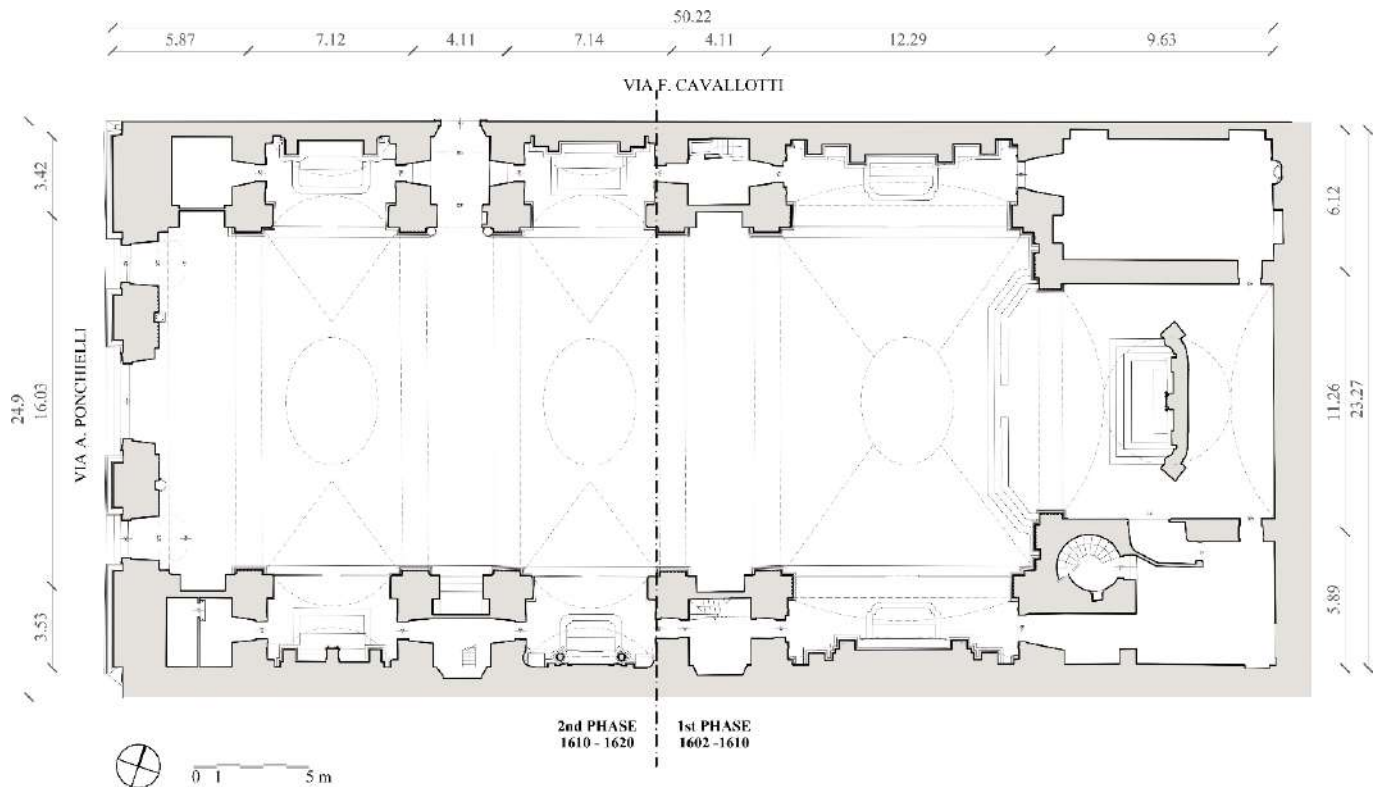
Plan of the church of the Saints Marcellino and Pietro with the projection of the vaults: a brick vault separates the large (about 15 m wide) Latin cross liturgical hall with a pseudo-transept from the attic space and the wooden roof. (Image source: geometrical survey, courtesy of R.T.C. di Colturato & Pedrini).
